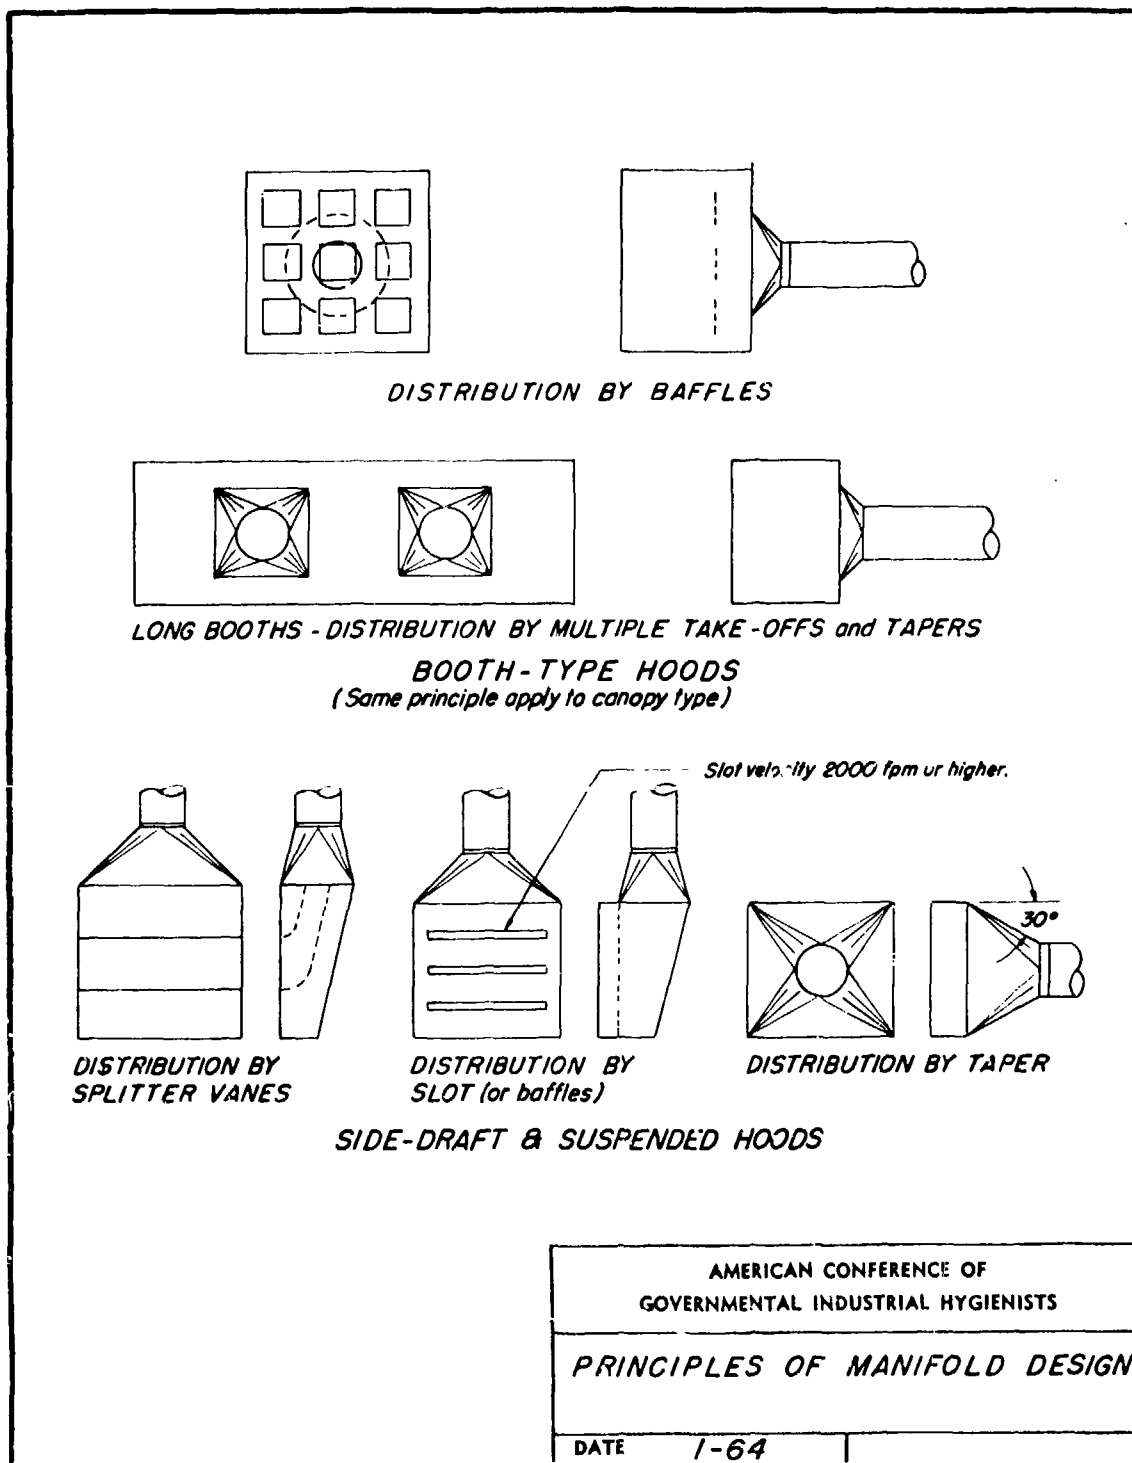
Principles Of Manifold Design For Capturing Hoods
